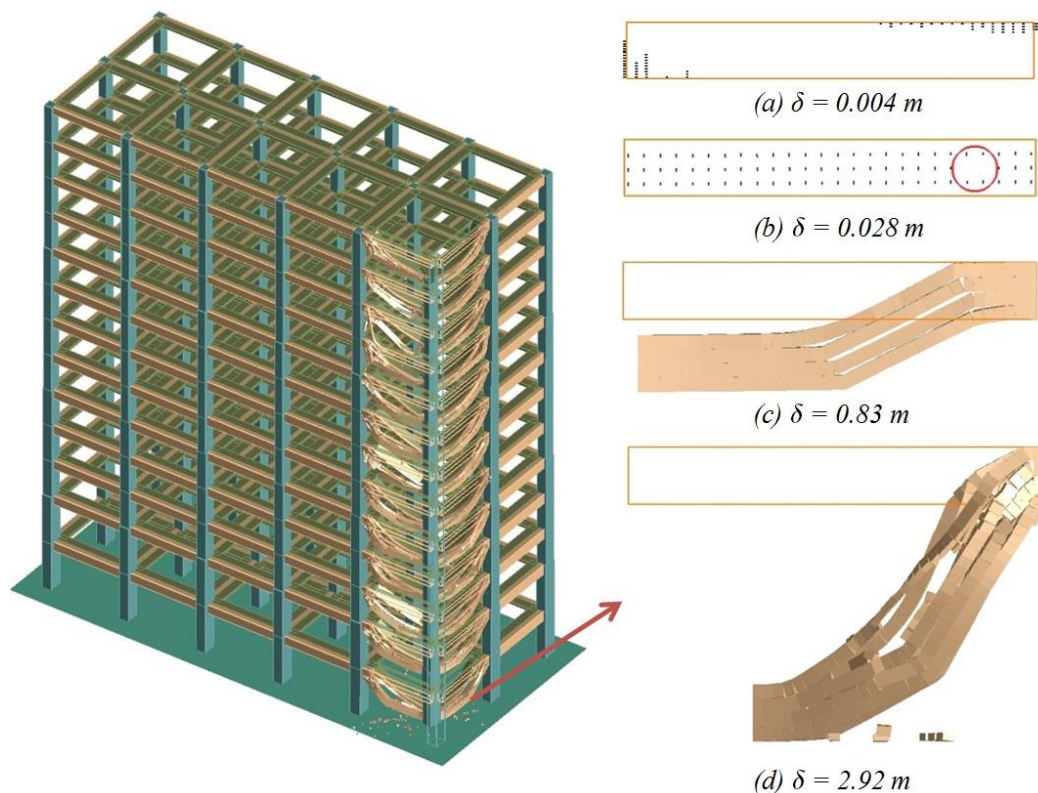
Progressive collapse of the AEM model under  $1.75(DL+0.25LL)$ : (a) concrete cracks in tension; (b), (c) rupture of the stirrups; (d) beam failure
